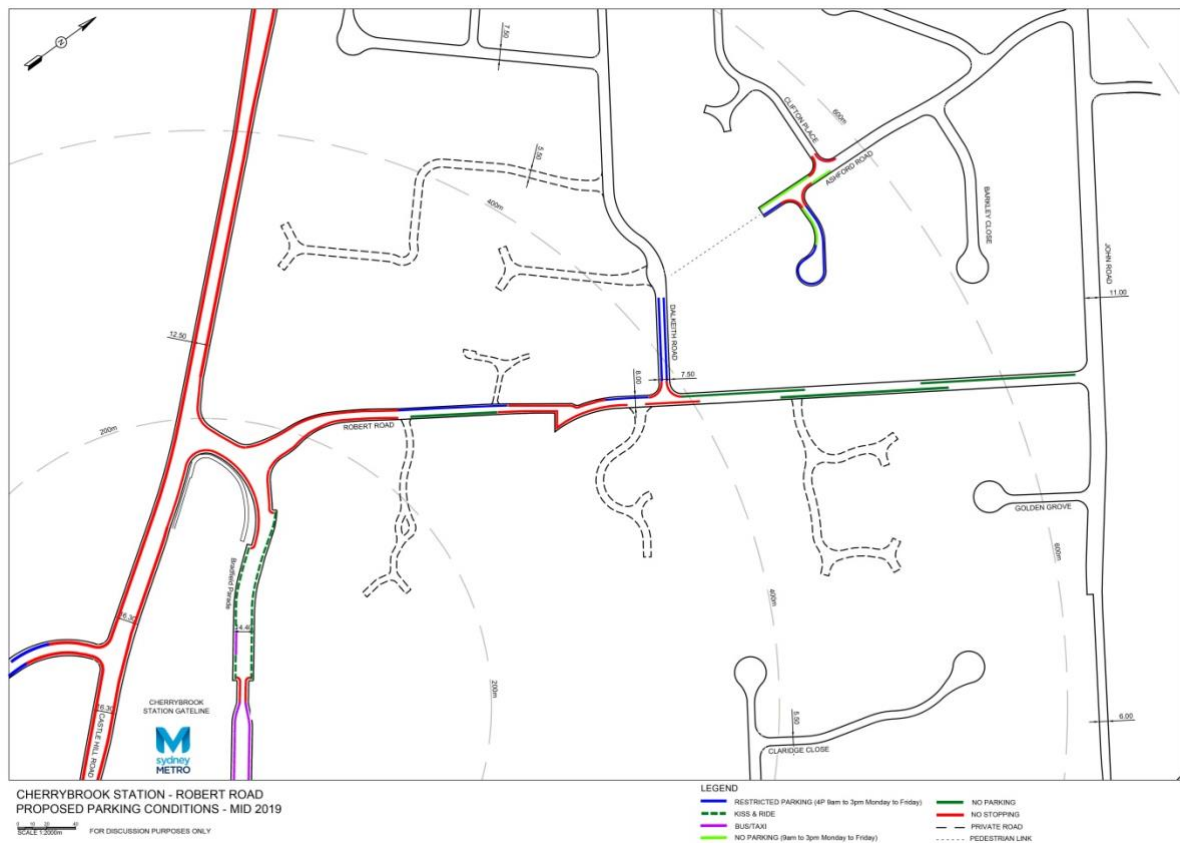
Proposed parking conditions mid-2019 – Robert Road and linking streets
